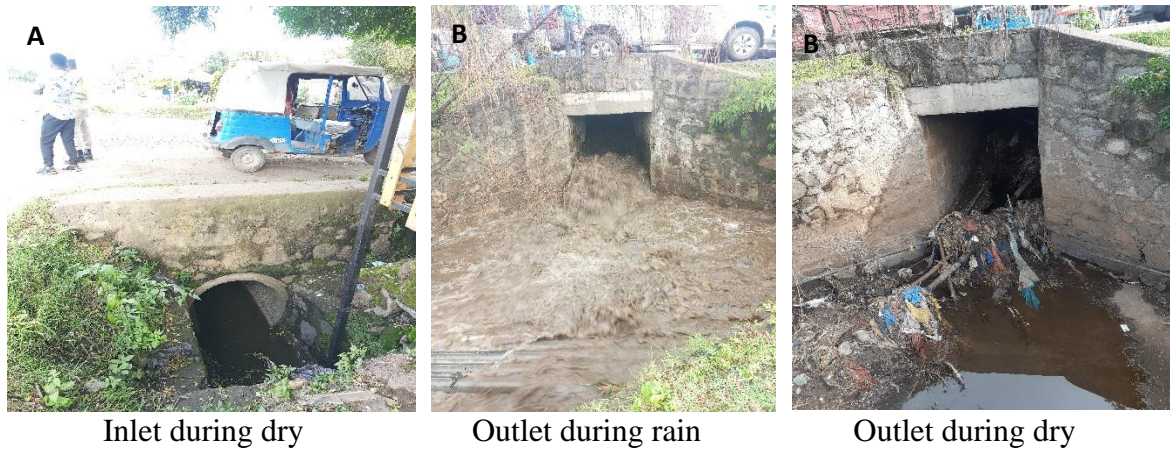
19: Ziquala culvert inlet and outlet configuration, BC<sub>2</sub>.
